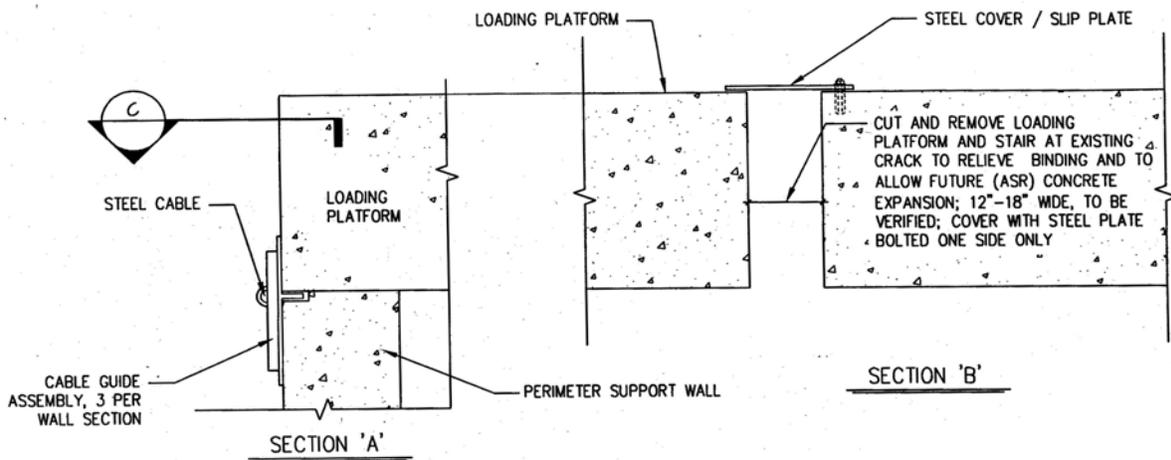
Detail of conceptual stabilization recommendations including relieving cut in loading platform slab and use of steel cable and plate to restrain outward movement of wall.
